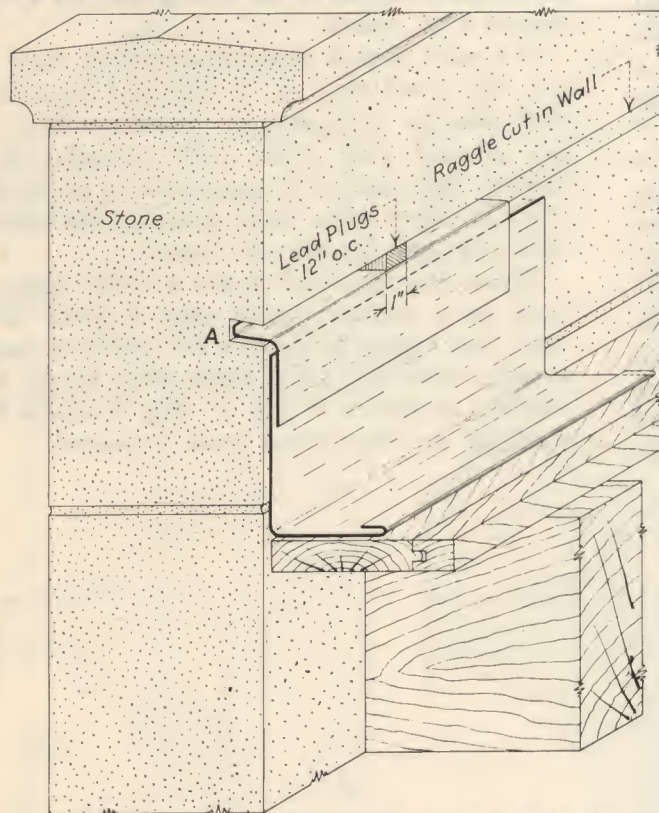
BASE AND CAP FLASHINGS JOINING A STONE WALL
